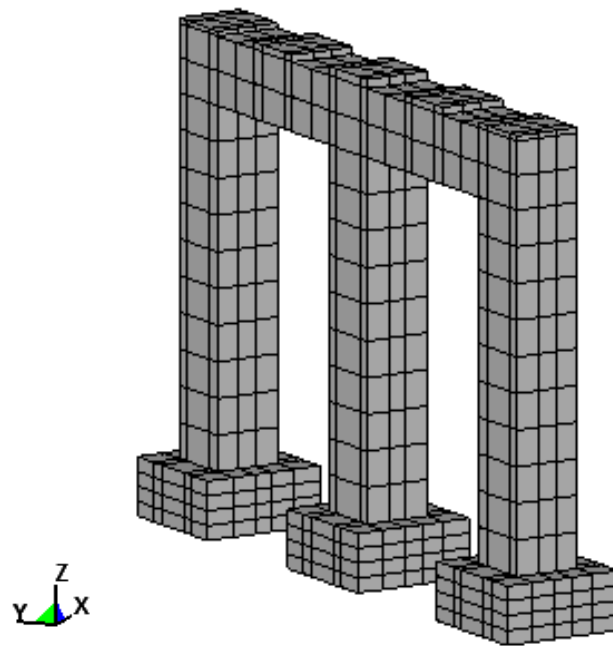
Isometric view of solid element discretization for the reinforced concrete pier and footings.
